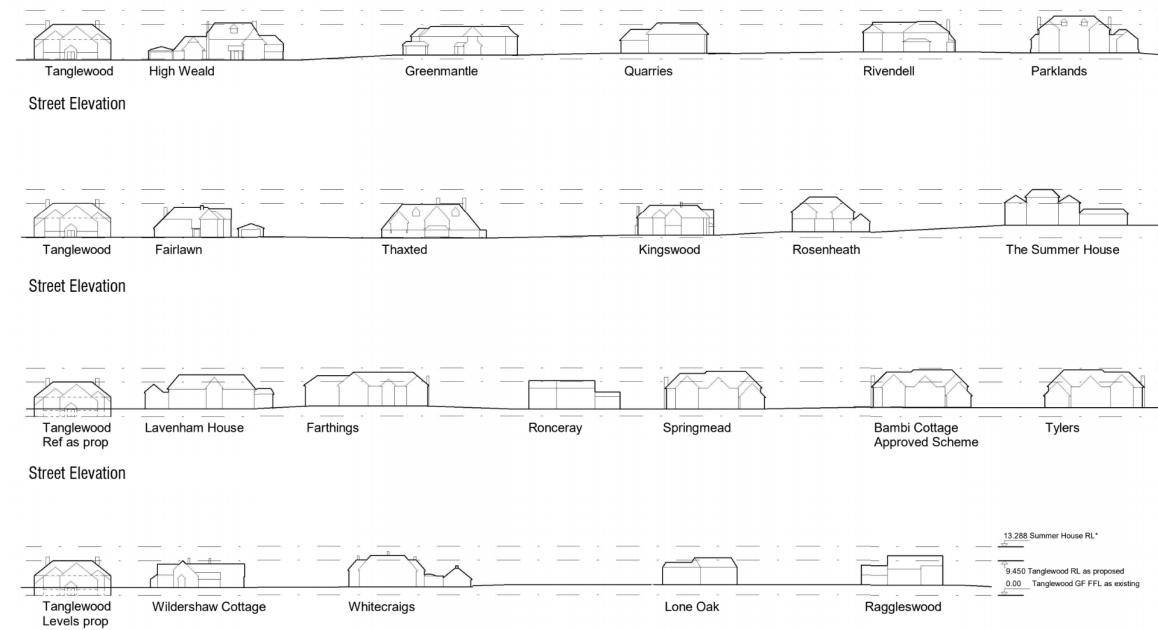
Parkfield elevations. Please, refer to the drawing 02.2.12 attached
